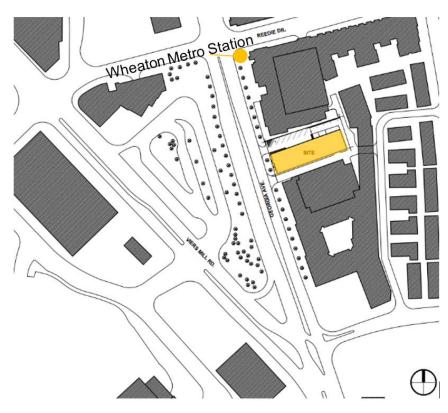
Building Location on Site, Courtesy of Bonstra Haresign Architects
